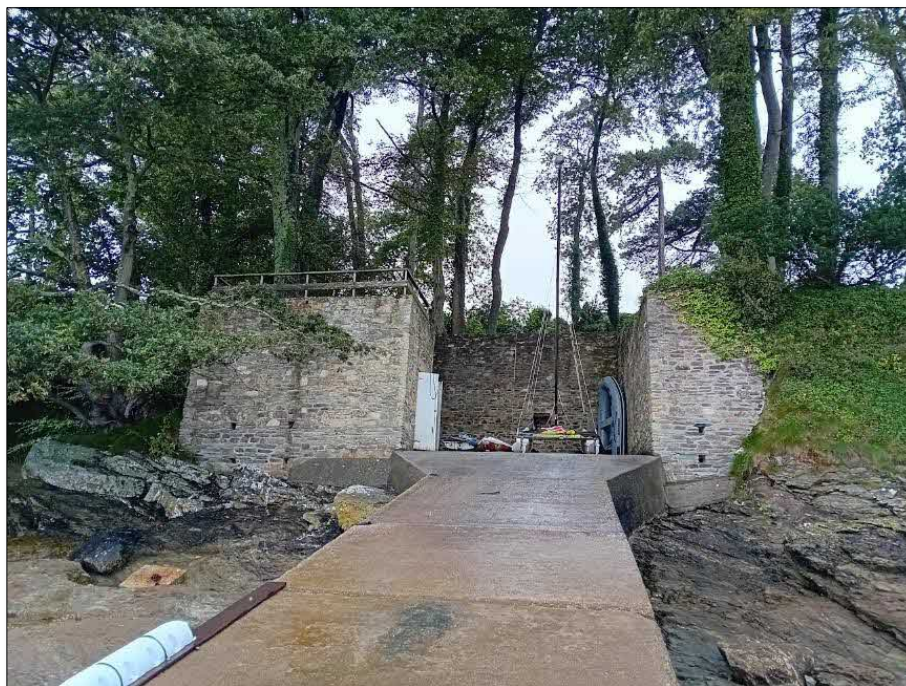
The existing boat storage area with sea walls along the shoreline, from the beach looking west.
